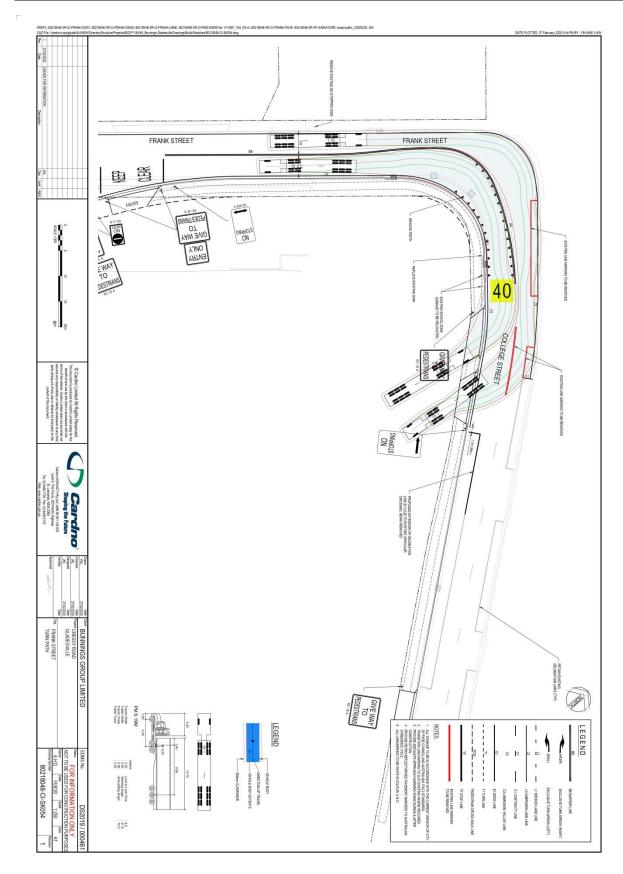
Swept Path – 19m Semi-trailers turning at Frank Street/College Street
